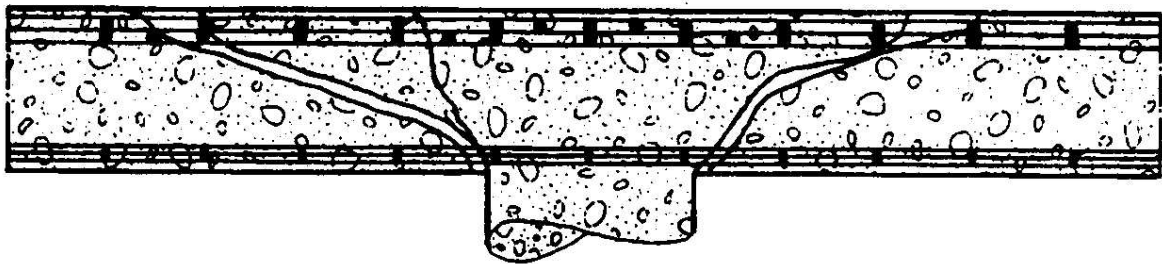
Typical shear failure near column. Proper detailing of shear reinforcement must be provided
